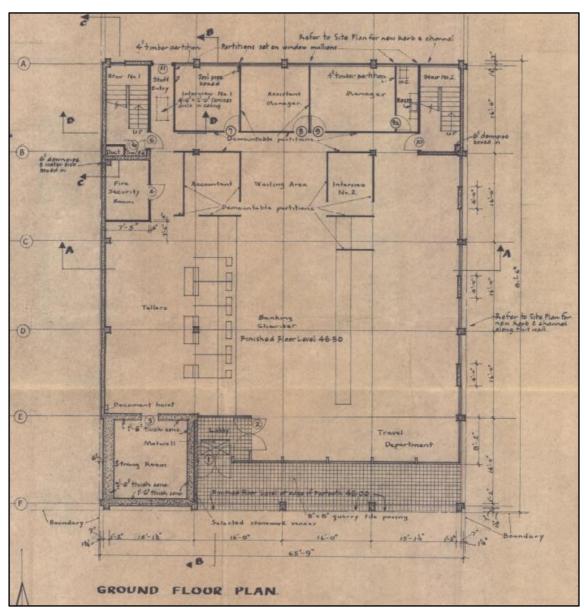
Detail from 1973 plan, showing the floor plan for the new ANZ building at 4 Tay Street (Sargent and Smith and Partners, 1973).
